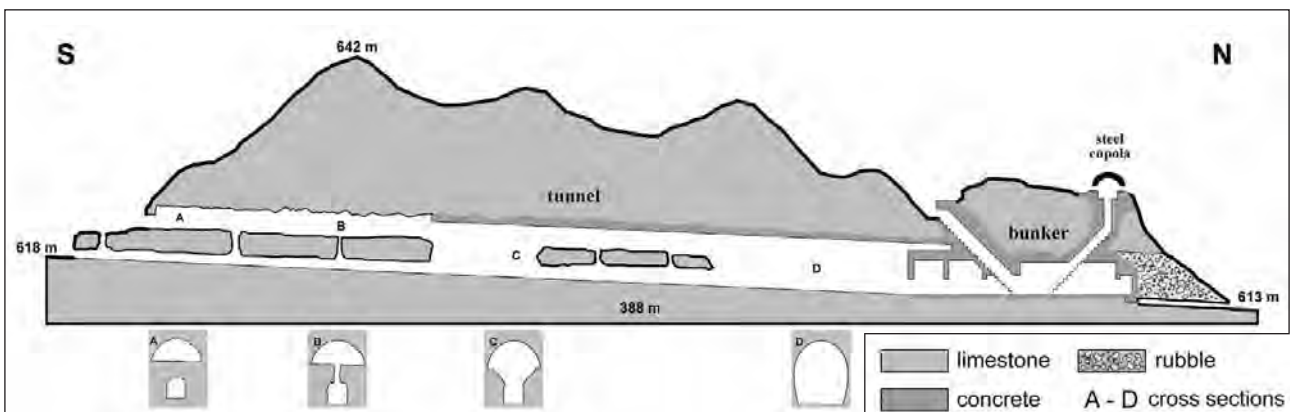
Schematic cross section through the tunnel. All building phases and the bunker are preserved.
